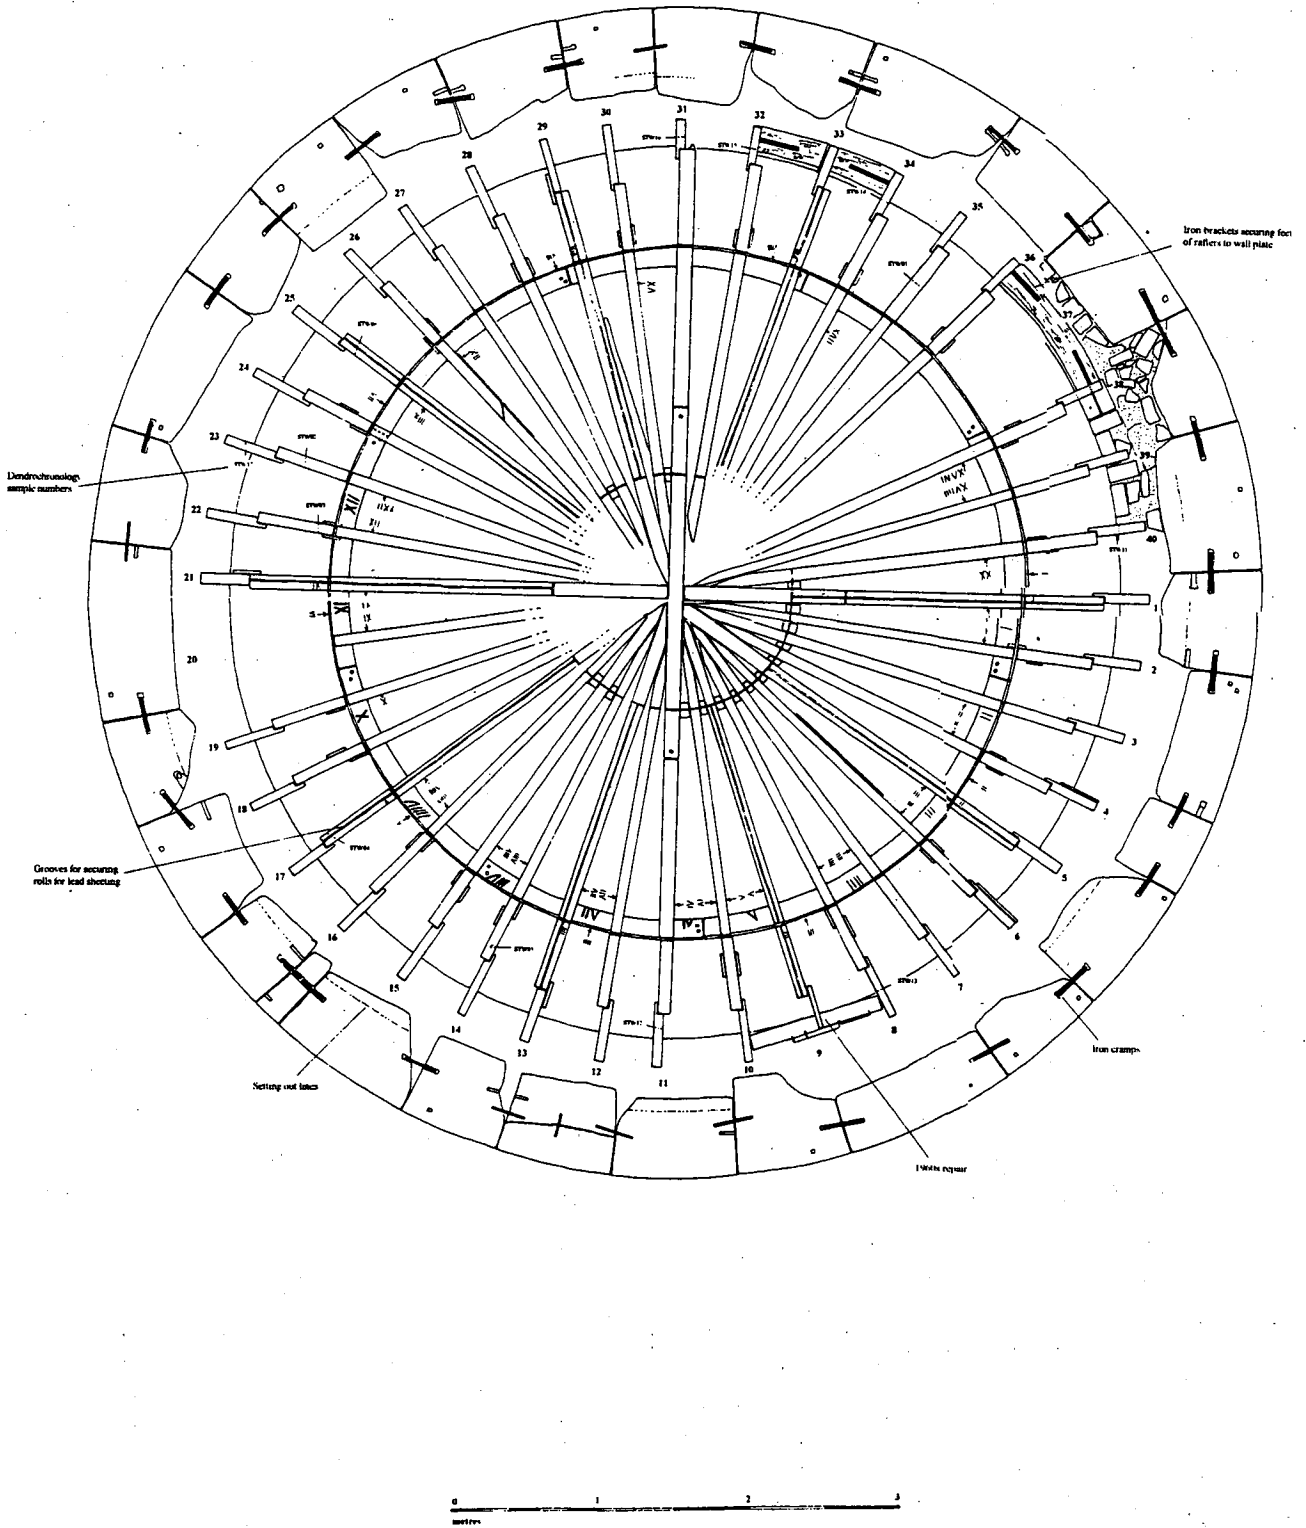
Stowe Landscape Gardens. Plan of roof construction of the Rotunda.
